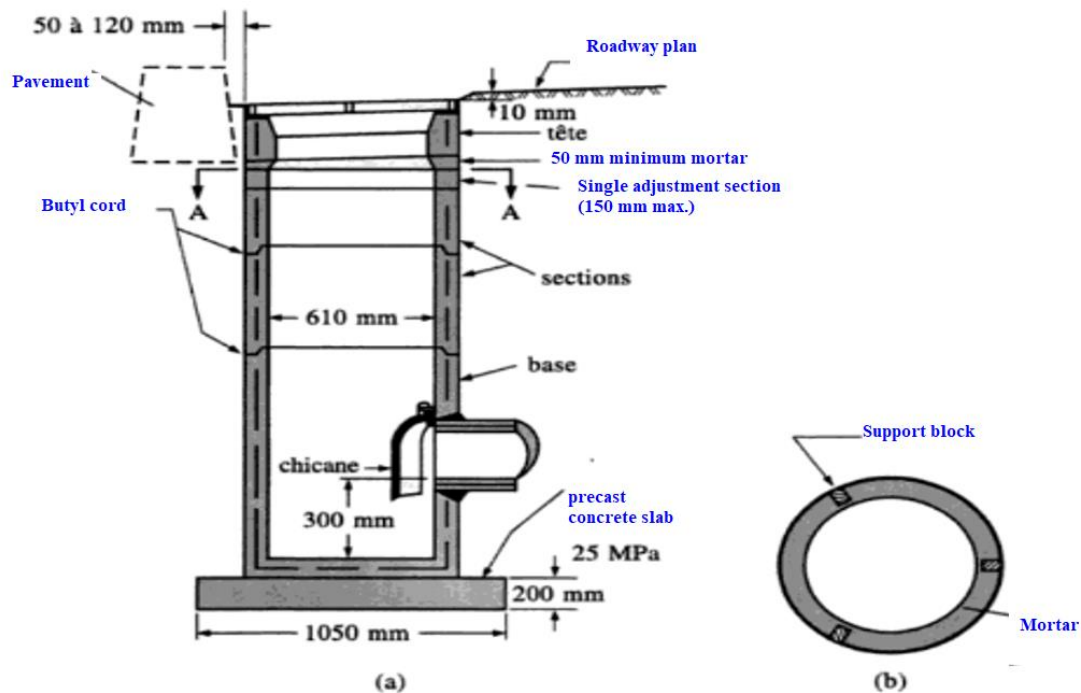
Drop manhole : (a) Vertical cut view ; (b) Horizontal cut view (A-A)
